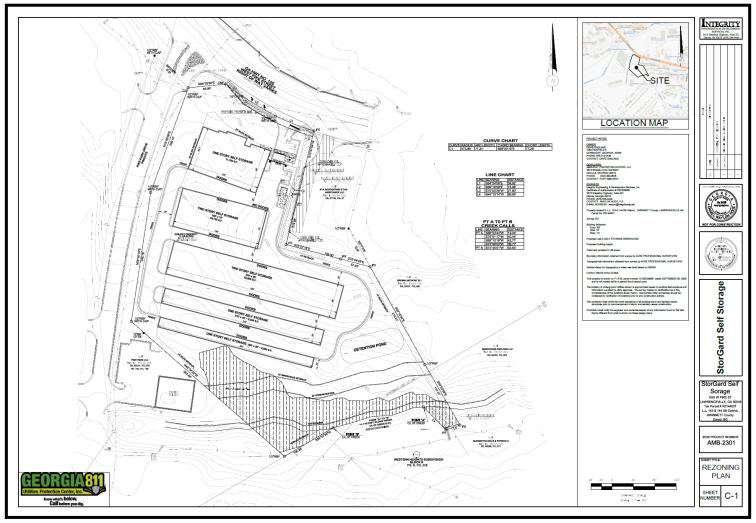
Overall site plan proposed at West Pike Street & Pike Park Drive.
